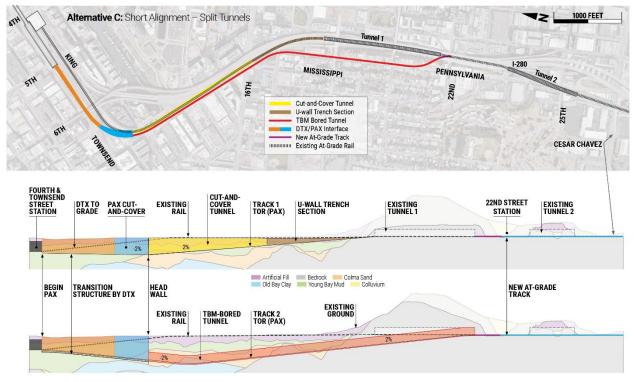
Short Alignment – Split Tunnels. Rail and Existing Caltrain Tunnels Noted. See also Appendix B.
